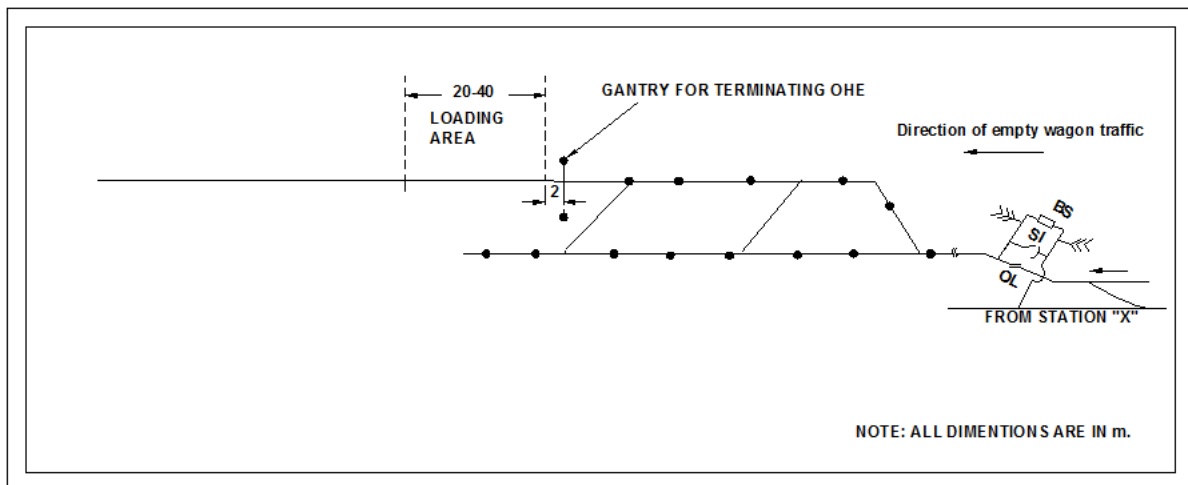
(Drawing No. TI/DRG/OHE/hopper/00002/09/0)-Yard layout & location of electrical equipments in case of Scheme-II
